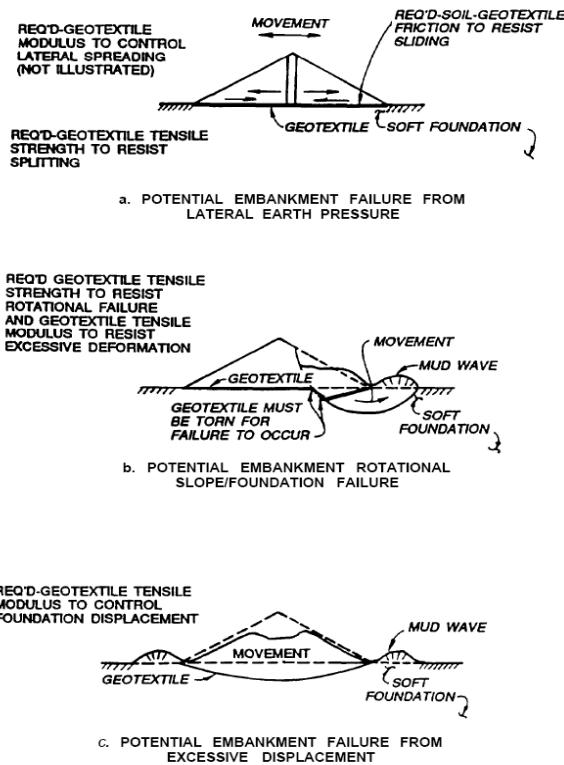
Modes of potential embankment failure(Daigavane & Ansari, 2020)
